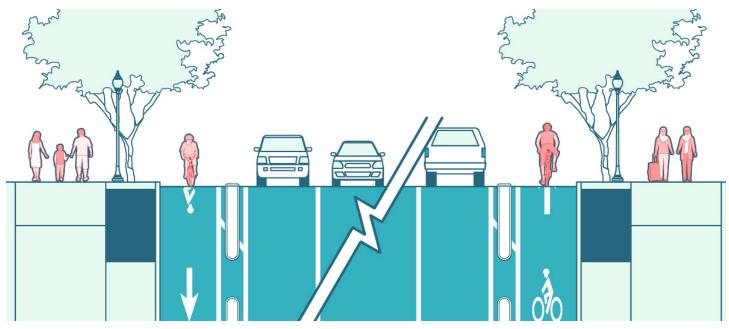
One-way Separated Bike Lane, Parking Separated, Interim Condition: Downtown Street, Town Center Street, Industrial Street
